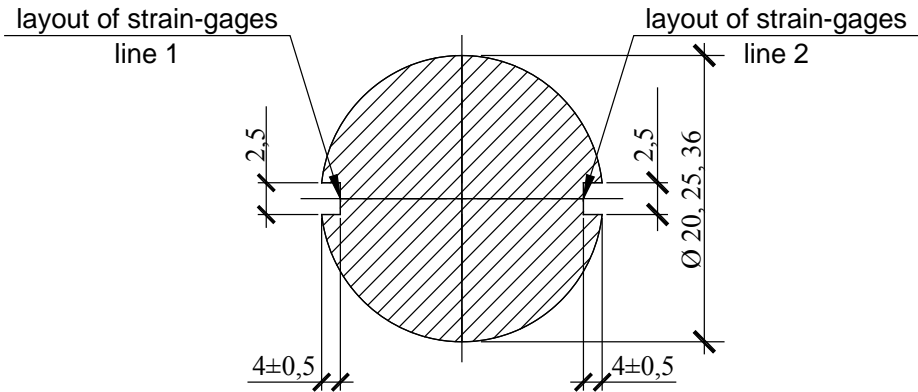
Layout of strain-gages on the reinforcement bar
